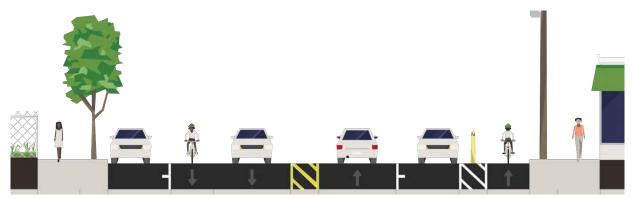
Proposed cross section of Evans Avenue between Napoleon and Rankin Streets, looking west
